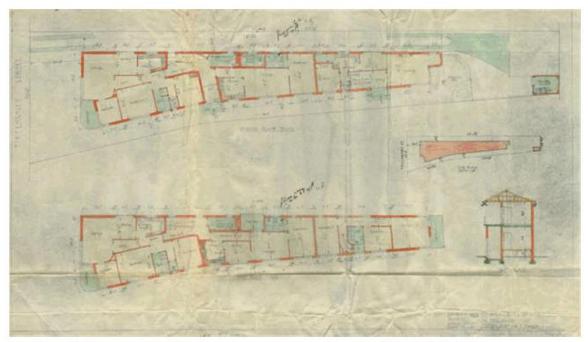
The approved building floor plan as submitted to Council in 1947. (BA1-1947)
